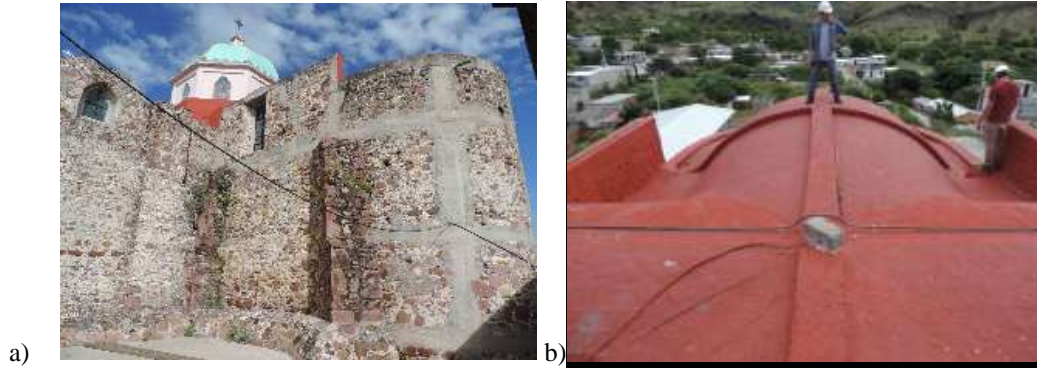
Temple of Santiago Cacaloxtepc reinforced with concrete element: a) walls and b) vault
